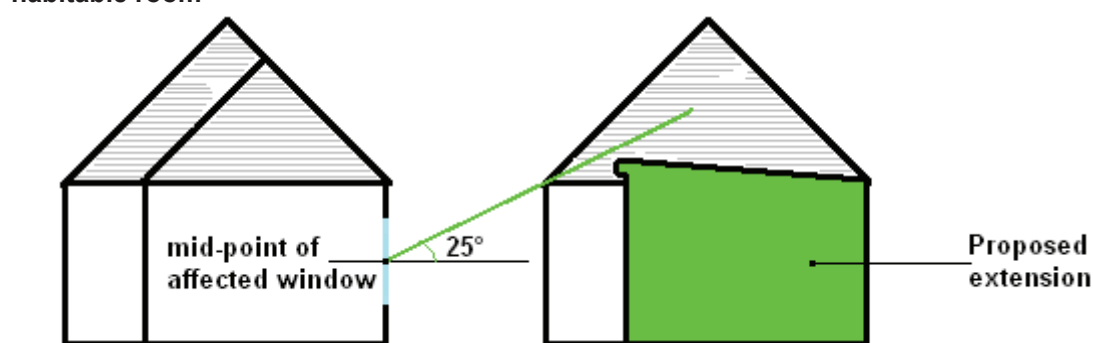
Fig B: Proposed extension would not result in loss of daylight to adjacent window of a habitable room
